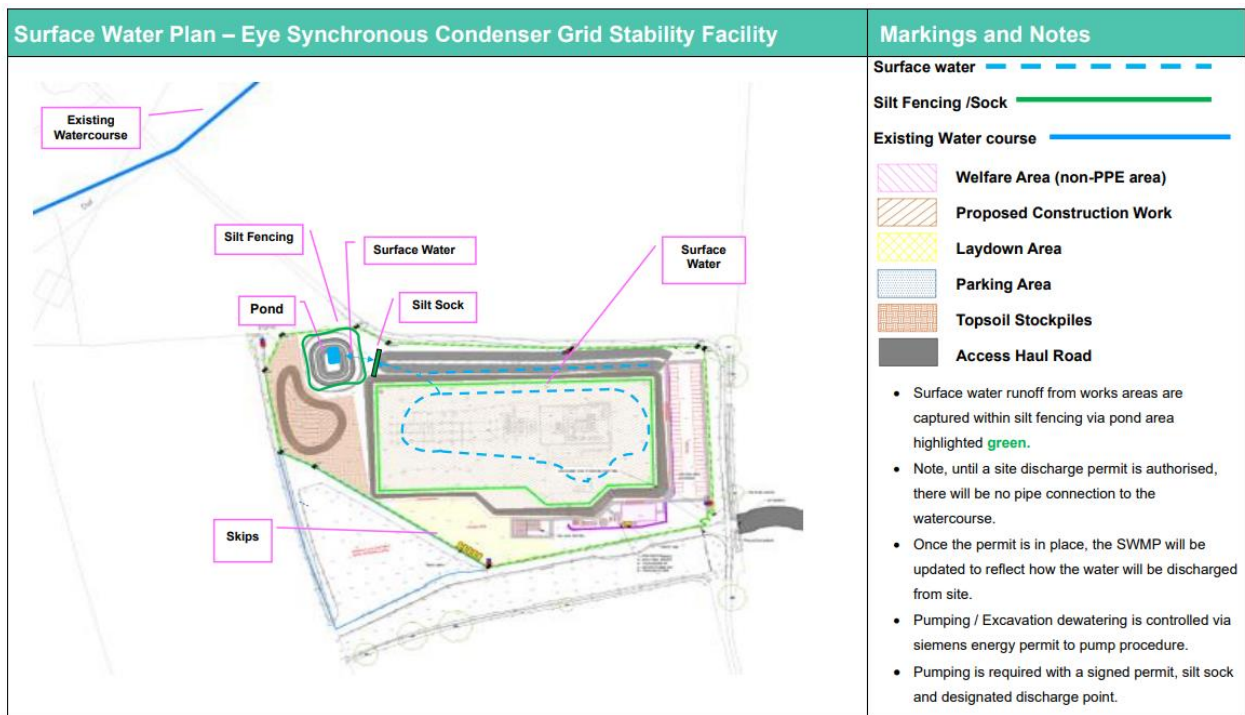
ACS (Civil Contractor) Temporary Surface Water Management Plan
